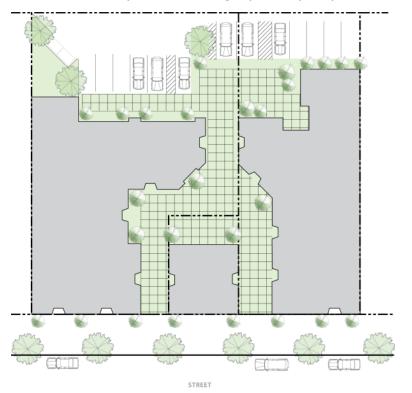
D.1. Example of connecting adjacent open space with common design elements
